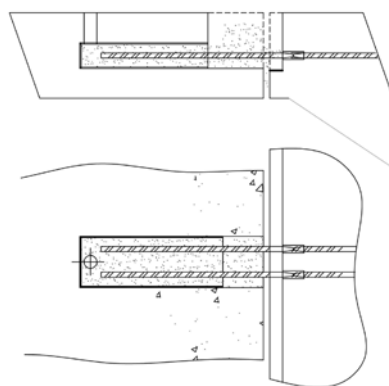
Section and plan example of a horizontal tie connection between precast flight and landing; coupled tie bars grouted into tubes cast into the precast landing.
